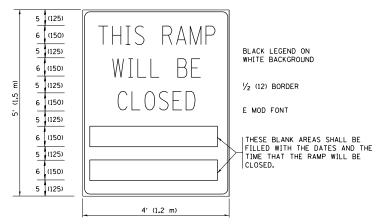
### DETAIL FOR REQUIRED BARRICADES & SIGNS
